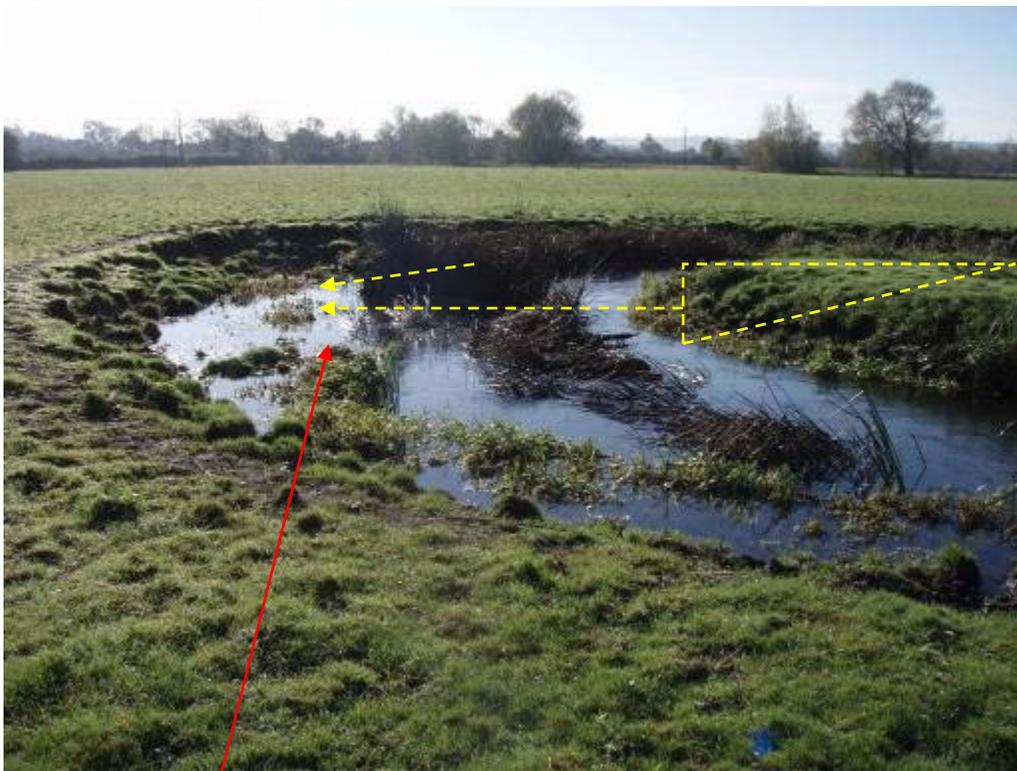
Create brushwood mattress on outside of bend. Place spoil from inside of bend re-profiling and club-rush beds on top. Protect from grazing.
